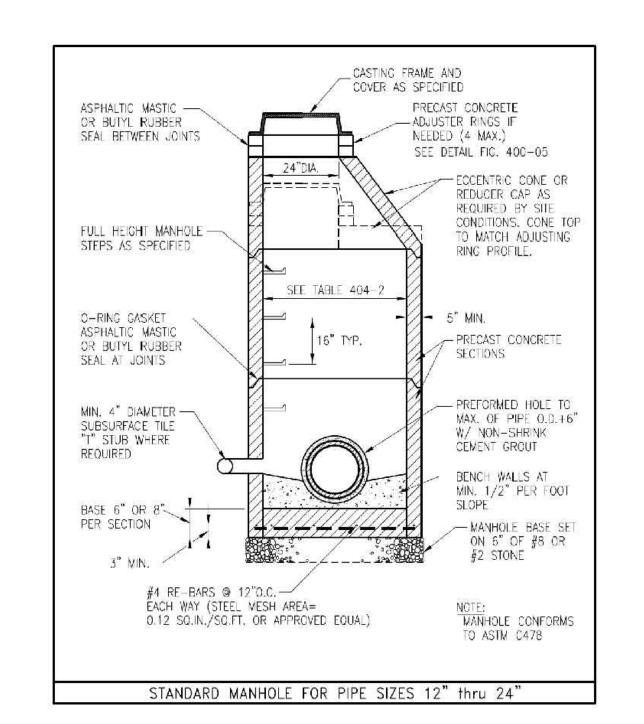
Standard Manhole for Pipe Sized 12" thru 24" NOTE: BENCH WALLS SHALL CONFORM TO SECTION 404.06 OF THE CITY OF INDIANAPOLIS STORMWATER SPECIFICATIONS MANUAL. THE BENCH WALL SHALL FORM A DEFINED CHANNEL, TO A MINIMUM HEIGHT OF 80-PERCENT OF THE INSIDE DIAMETER OF THE INLET AND OUTLET PIPES TO FORM A "U" SHAPED CHANNEL, CONSTRUCTED AT A MINIMUM 1/2 INCH PER FOOT SLOPE TO THE MANHOLE WALL.
